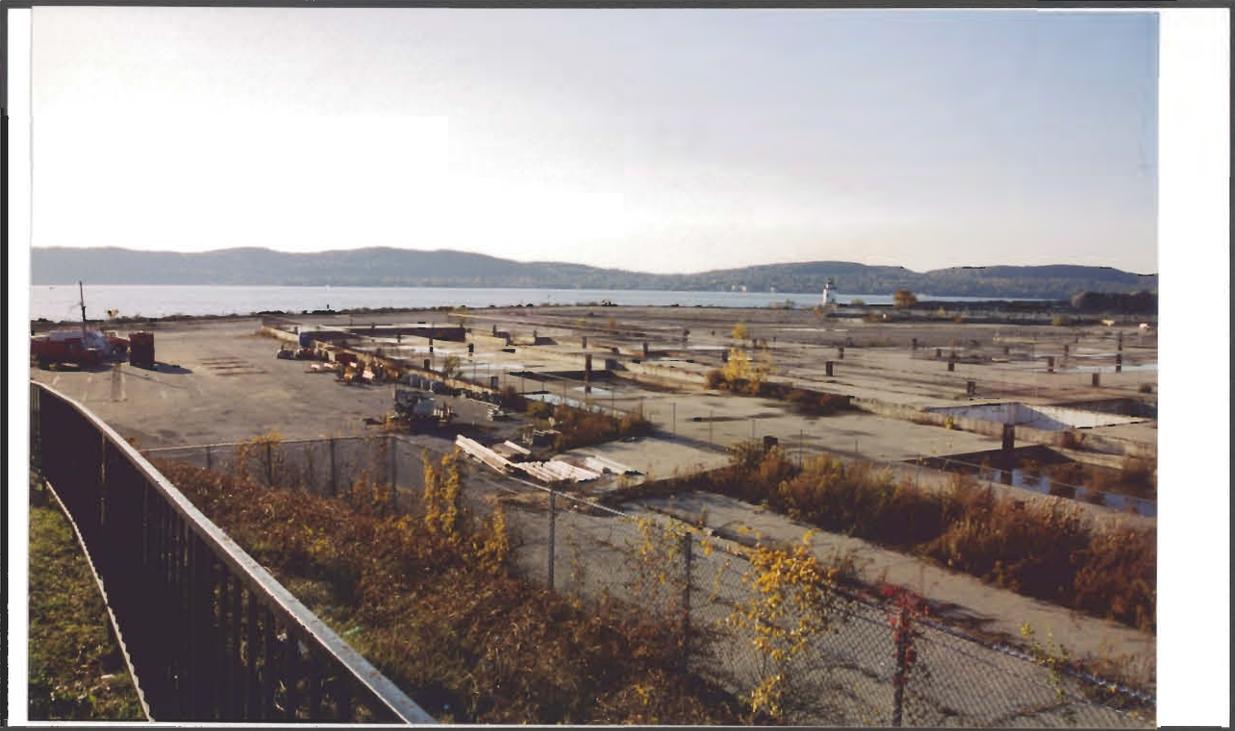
View to northwest from Beekman Avenue. Buildings and asphalt parking areas are located on man-made land. Historically the lighthouse, seen in distance, stood in open waters approximately ½ mile west of MetroNorth railroad.
